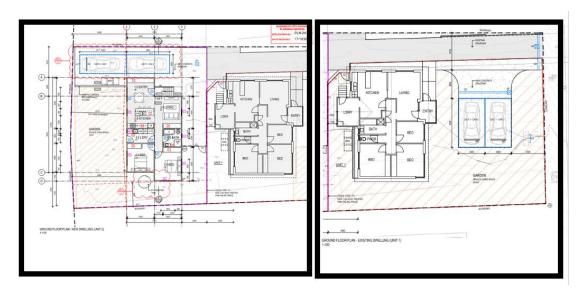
Proposed site plan (source: Applicant) note the image on the right shows the full floor plan of the existing dwelling and the carparking area.
